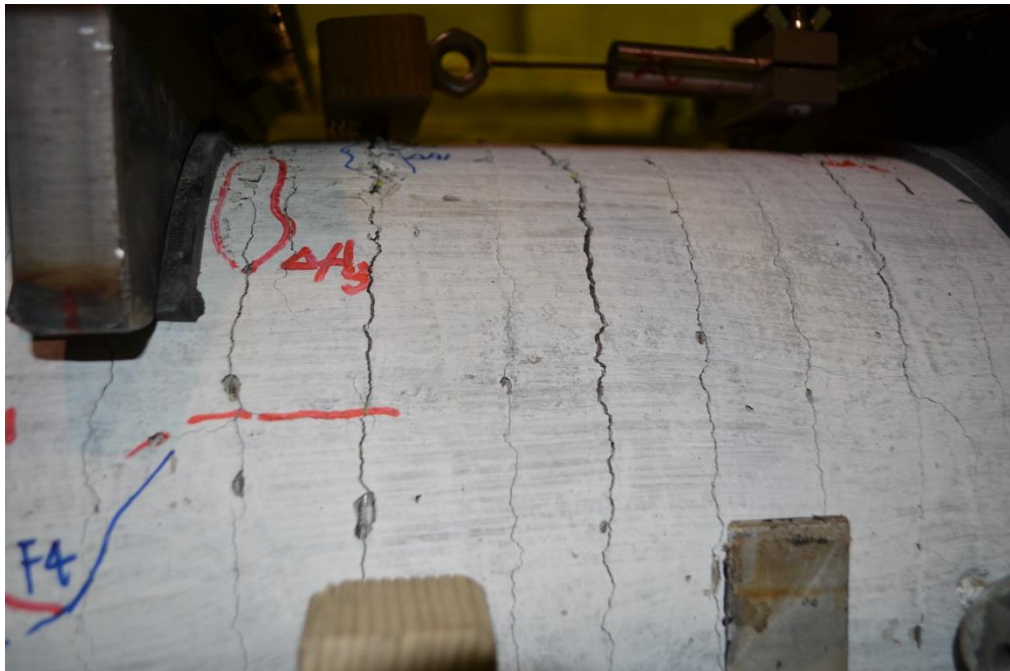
Close-Up View of Flexural Cracks in Specimen H2C2-C after Failure
